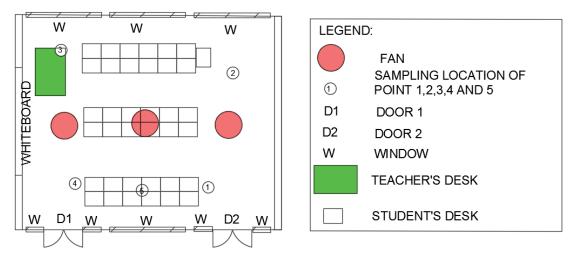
Floor plan at Level 3 of SK Bayan Lepas
